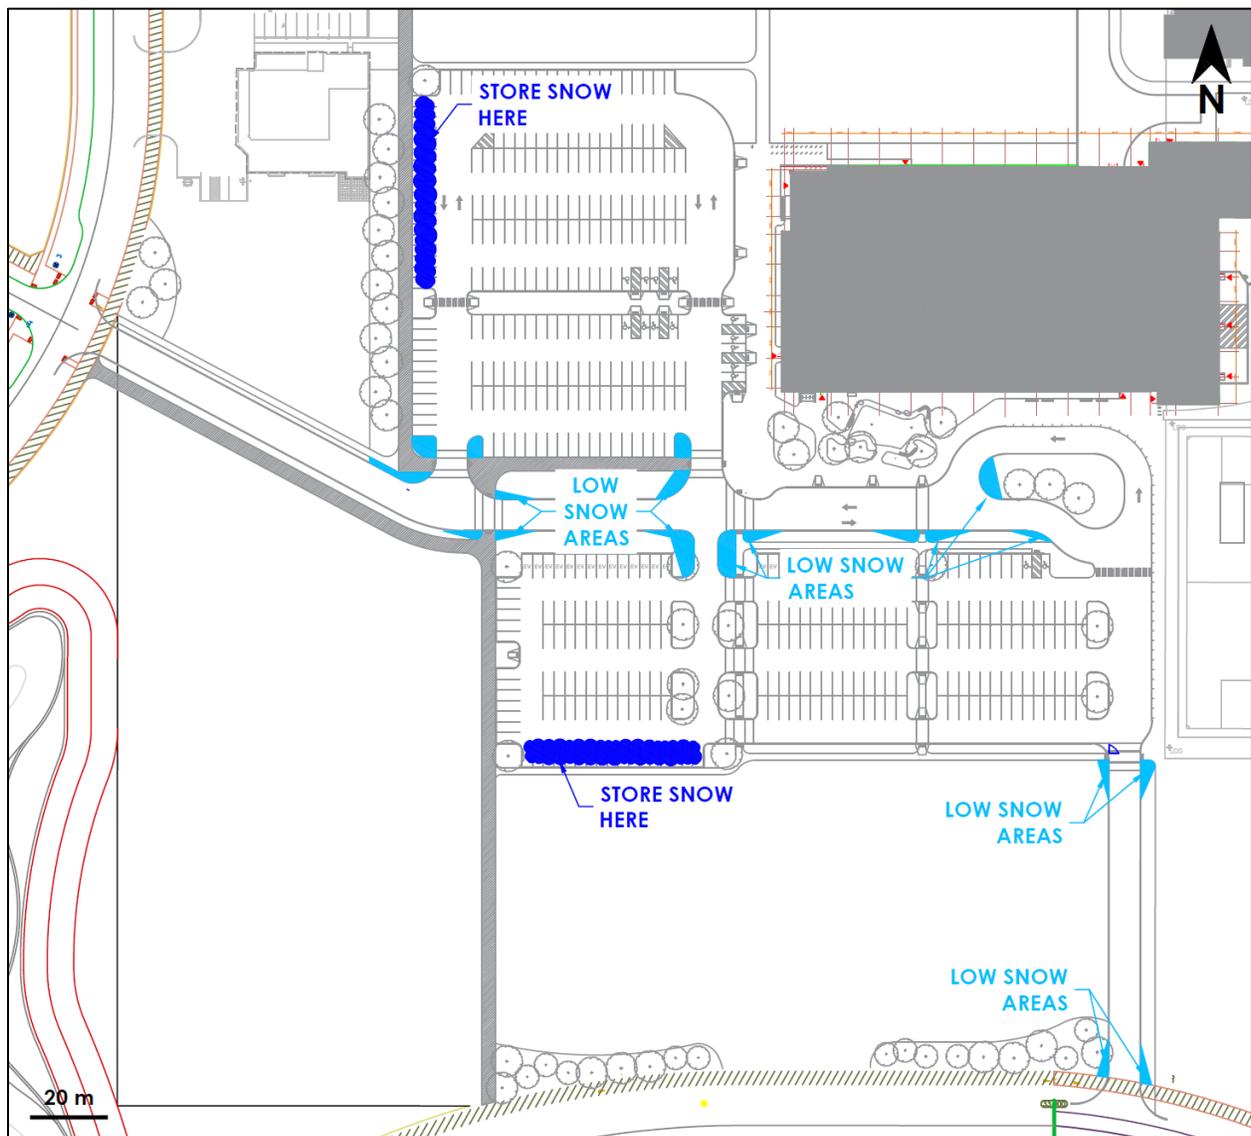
SNOW STORAGE RECOMMENDATIONS
